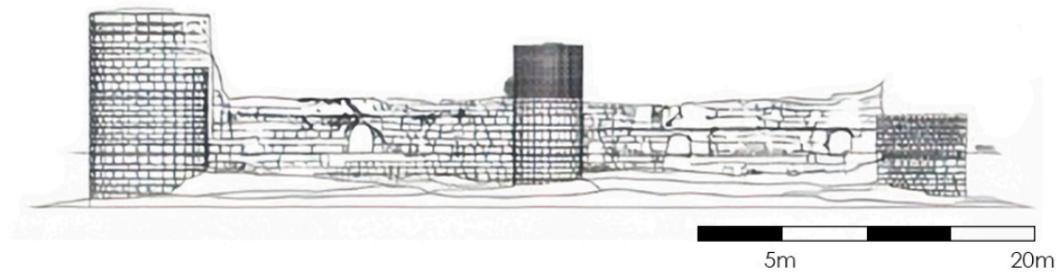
West elevation of the castle (Source: Miyar Mimarlık Mühendislik, 2020)
